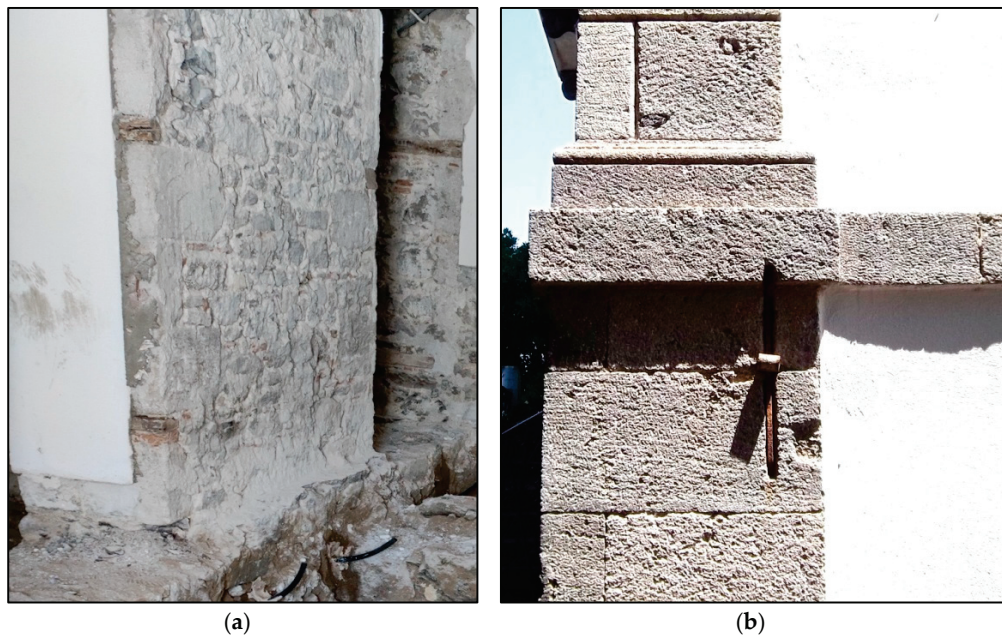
Structural features of AML: (a) The internal masonry construction method of the ground floor; (b) Metal anchor tie bar on the exterior face of the masonry (Source: Digital archive of the Ephorate of Antiquities of Lesvos (Hellenic Ministry of Culture and Sports), used with permission (Prot. No. 252765/16-06-2025)).
